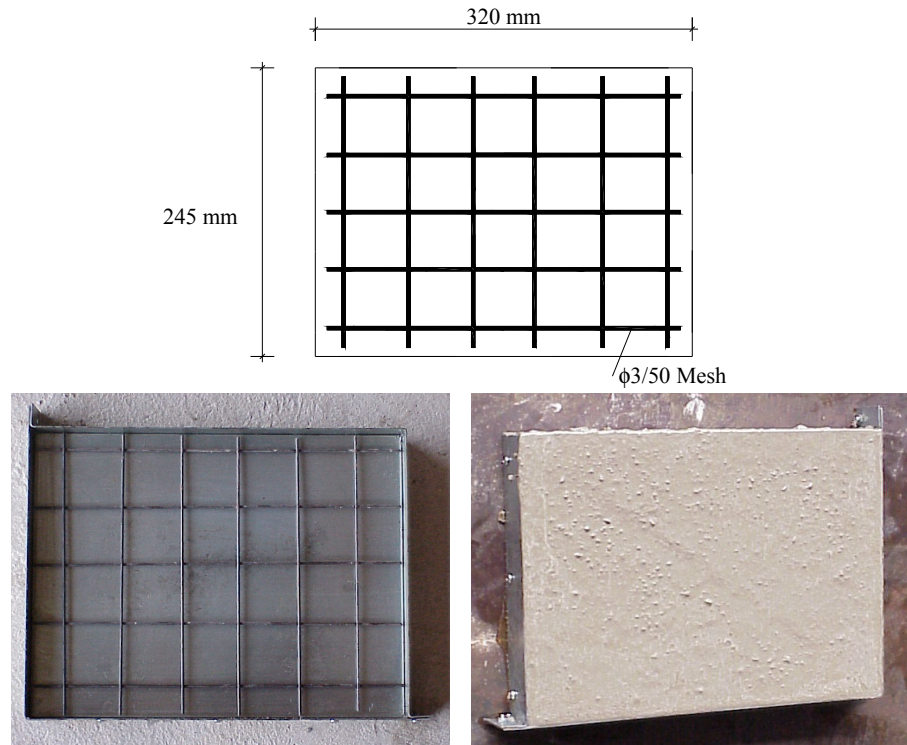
Dimension, reinforcement and moulding of Type C panels
